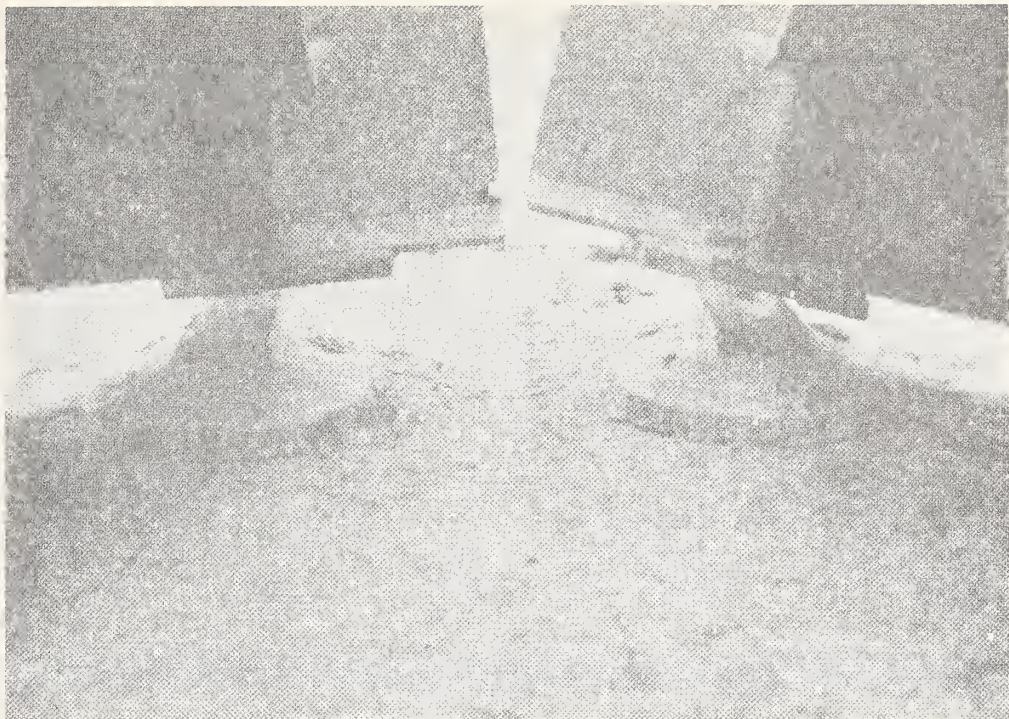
Damage to the girders at the seventh pier of the Showa bridge
